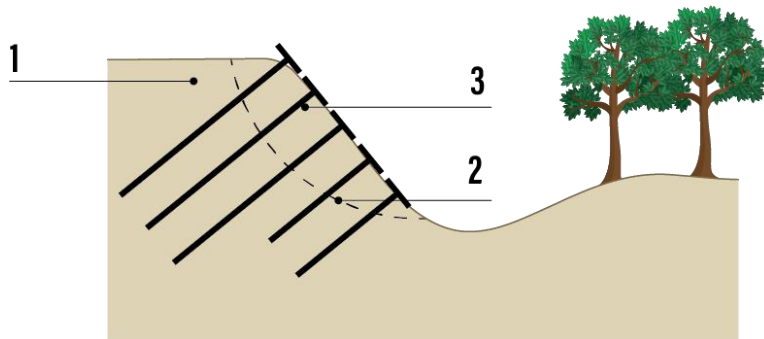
A cross-section through an unstable slope (1). A potential curved slip surface (2) is prevented from sliding by steel bar ground anchors (3) drilled and concreted into the slope.
